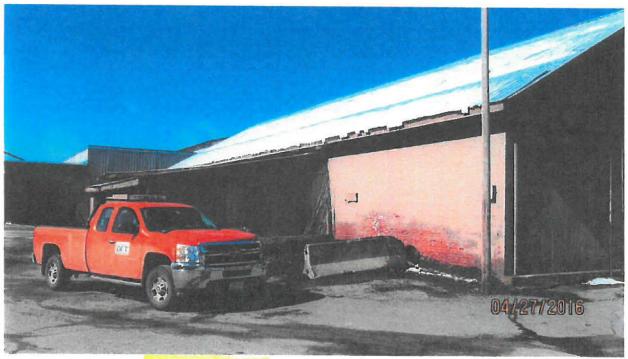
View of backside of building at the end near entrance to crew quarters showing significant damage.
